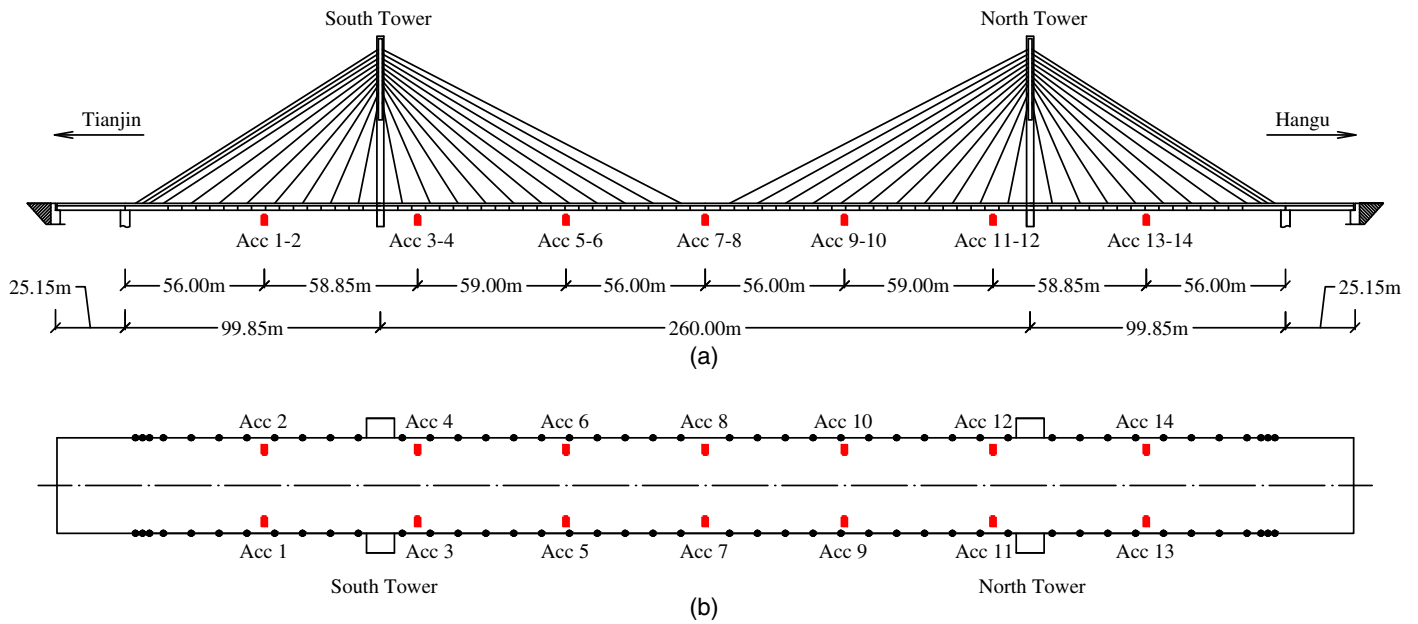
Tianjin–Yonghe Bridge: (a) elevation view, main dimensions, and accelerometer labels; and (b) bridge plan and accelerometer locations.
